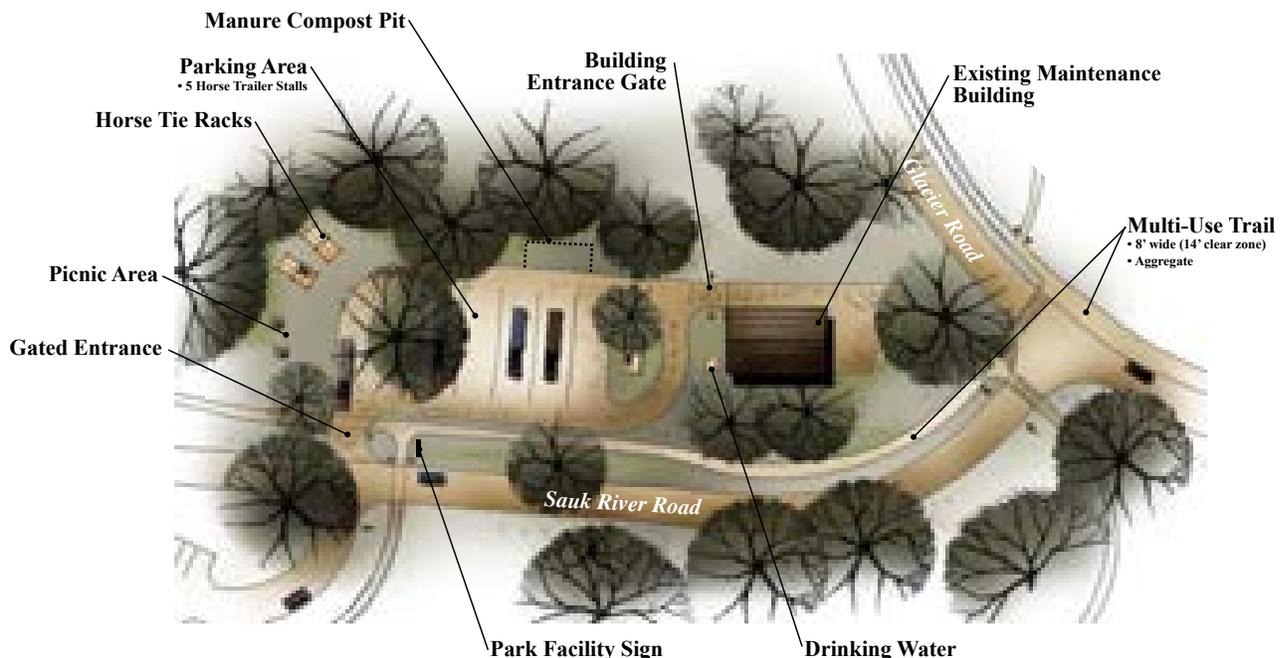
LAYOUT ENLARGEMENT PLAN OF THE HORSE TRAILER PARKING AREA & SITE AMENITY LAYOUT
